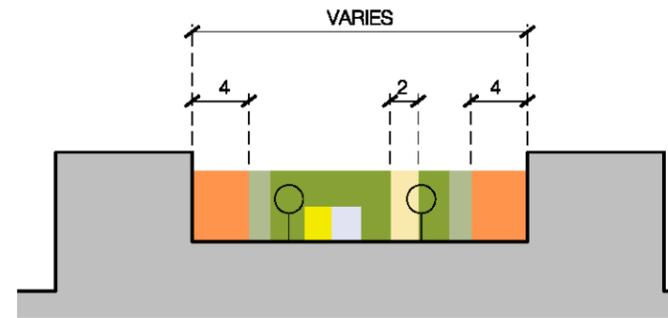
Coding section - Longitudinal Podium Garden with townhouses.
